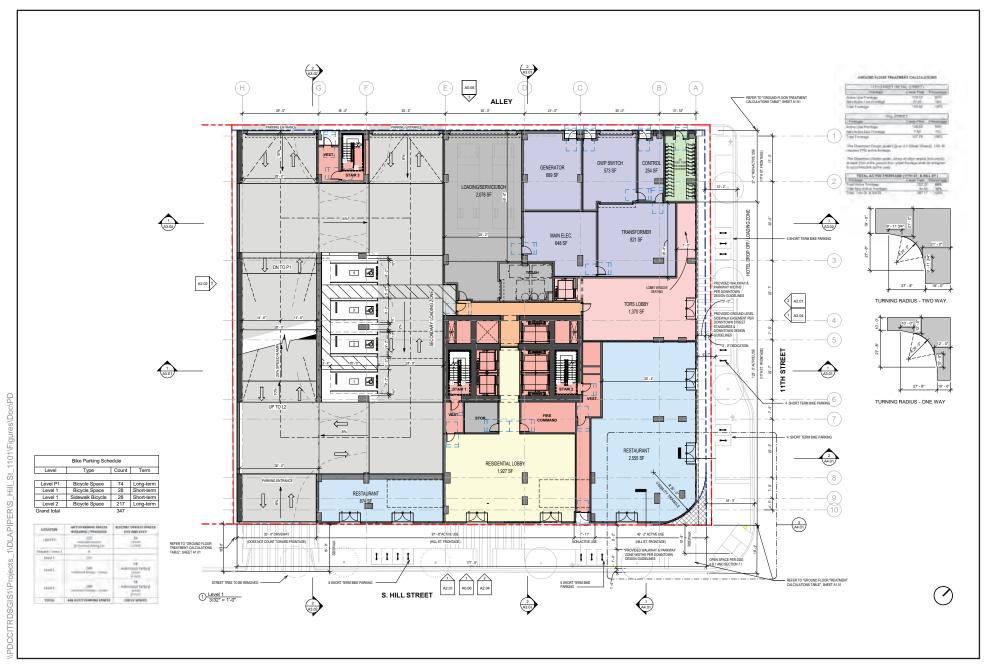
Ground Floor Level 1111 South Hill Street Project
